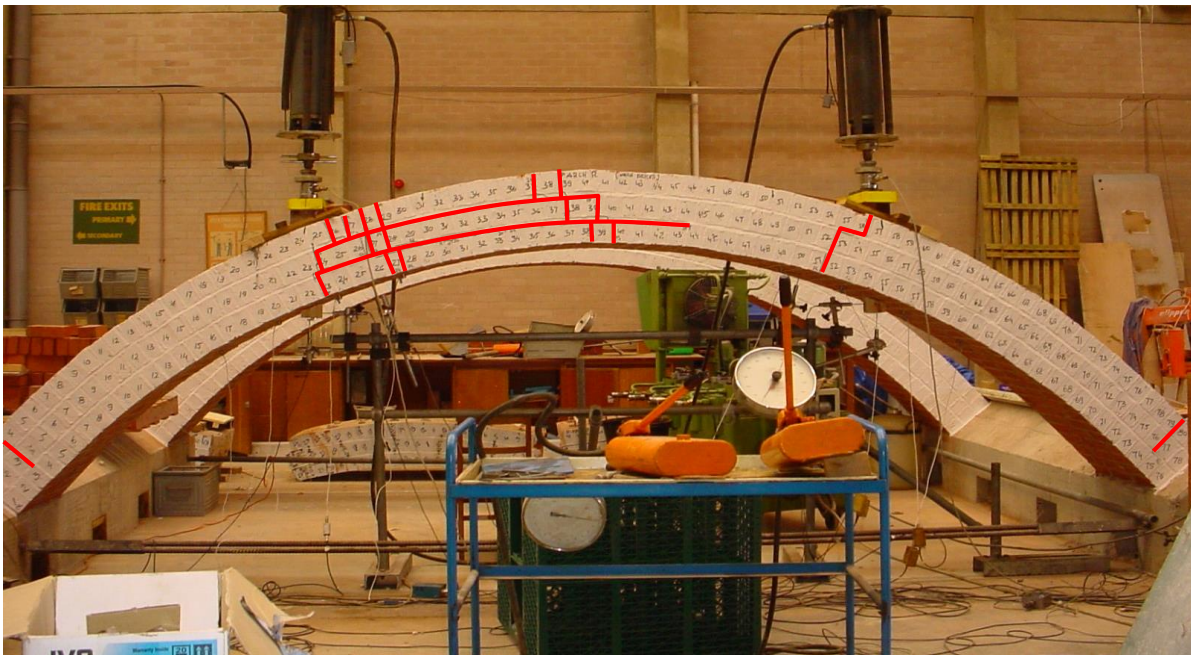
Failure mode of weal arch ring under static loading (Melbourne and Tomor, 2005).
